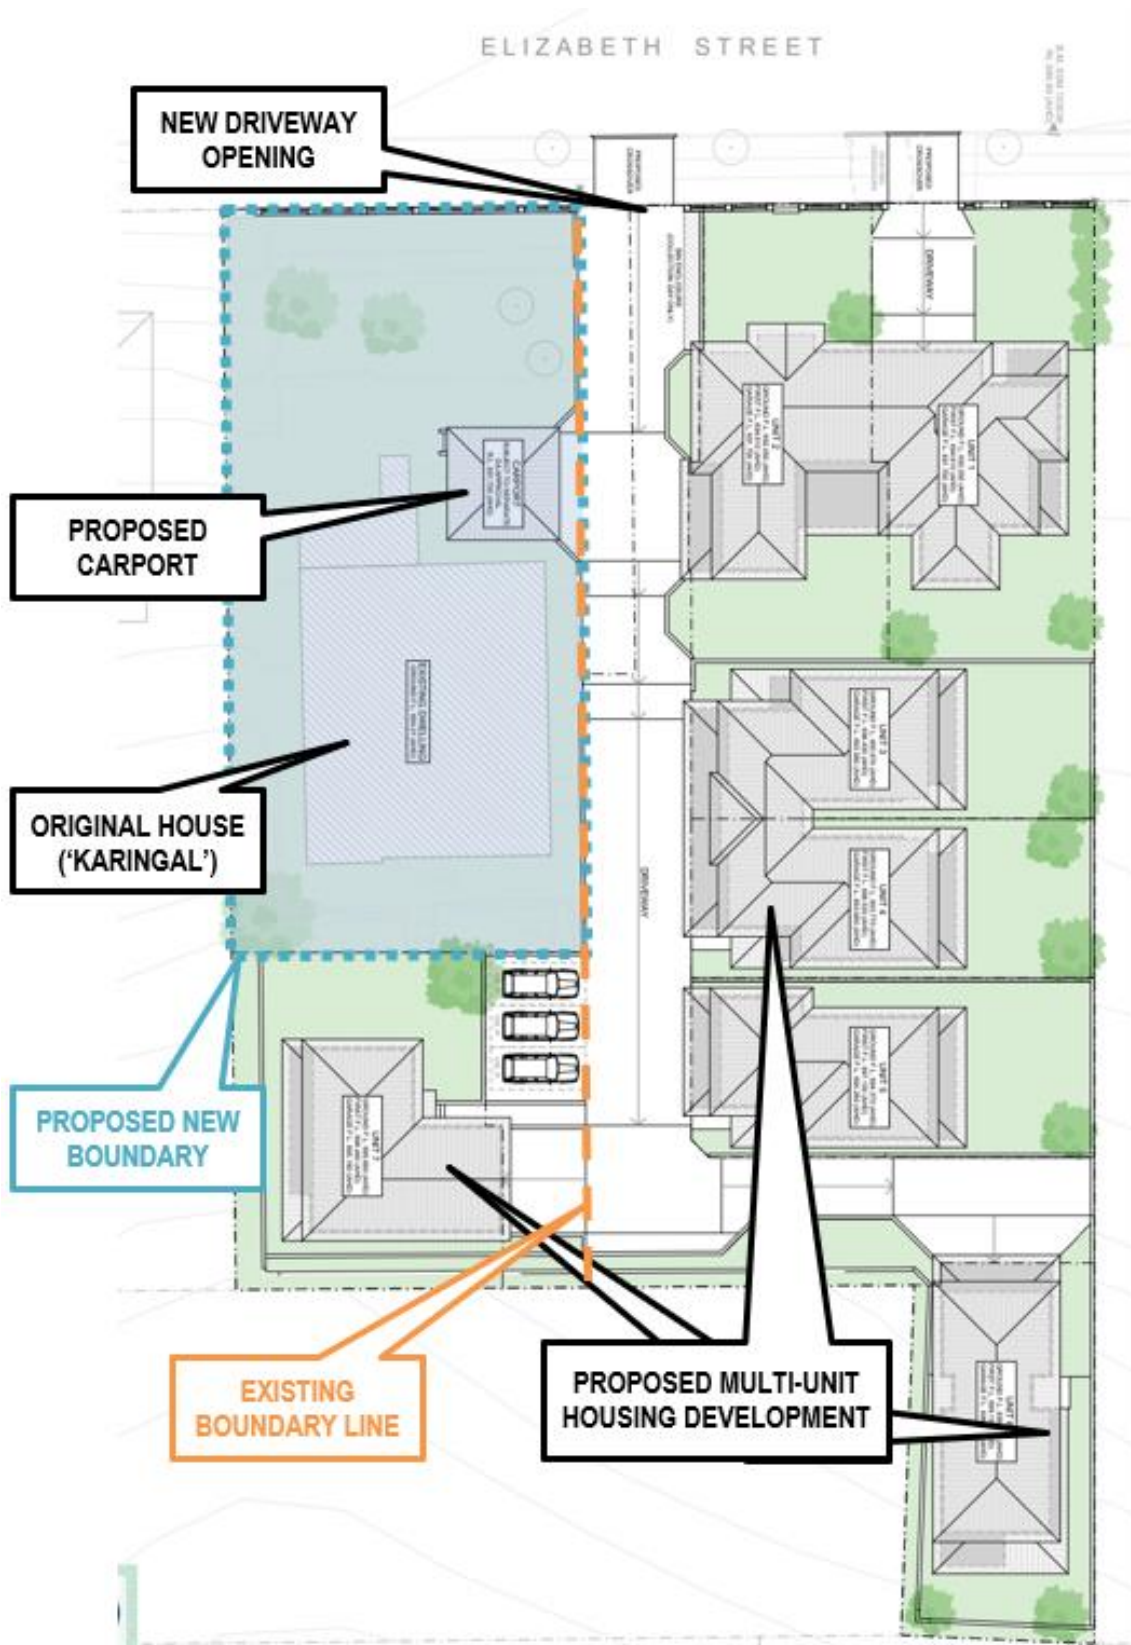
Proposed subdivision and development of 26 Elizabeth Street via DA 22/0513 and DA 22/0535 (from plans provided as part of DA 22/0535 with added annotations).
